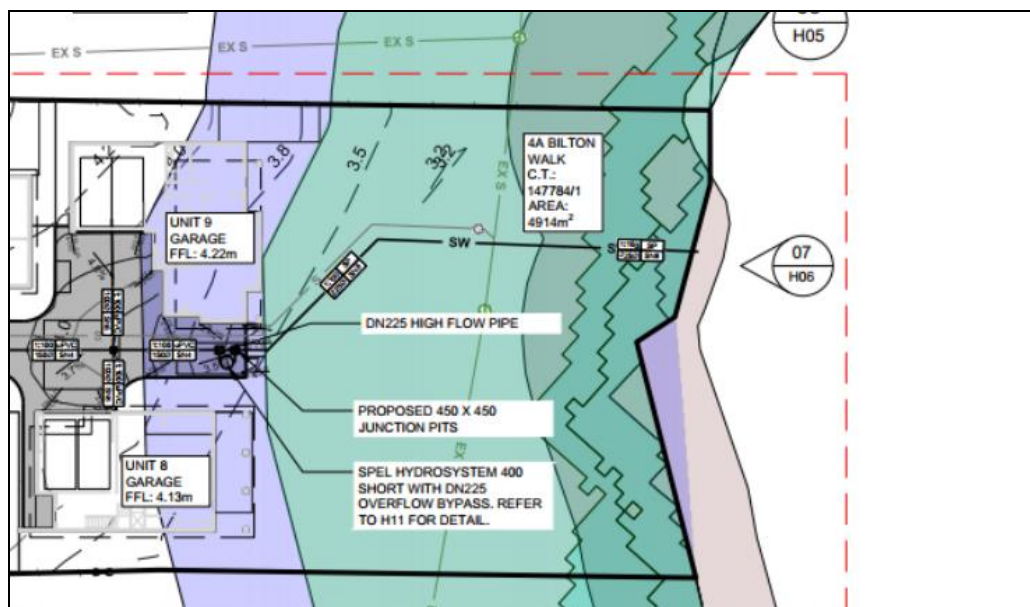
Snapshot of P3 Plans, page 33 – PLN-18-254
